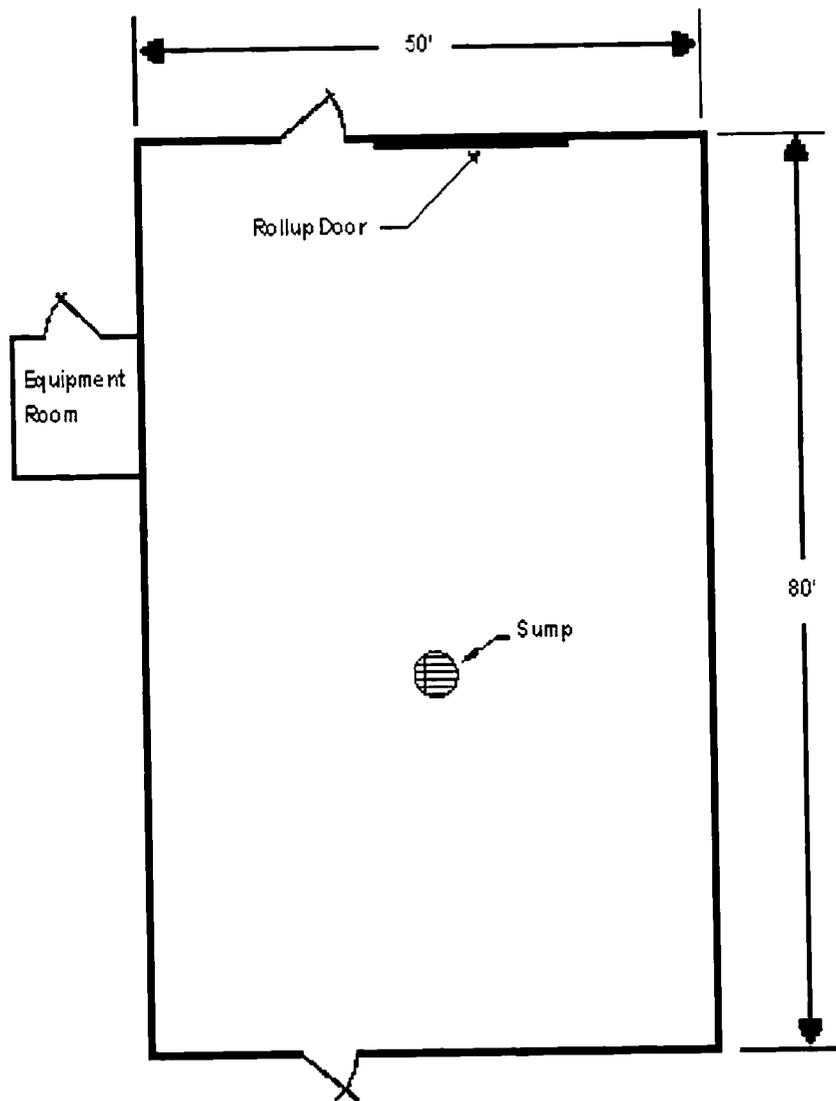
(Proposed) Solid Low-Level Waste Staging Facility, Building 7580.
